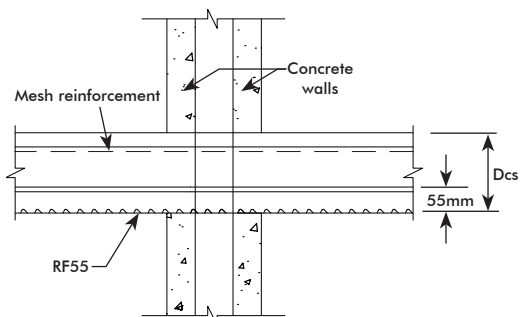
I RF55® Concrete Wall Detail - Continuous Sheeting
